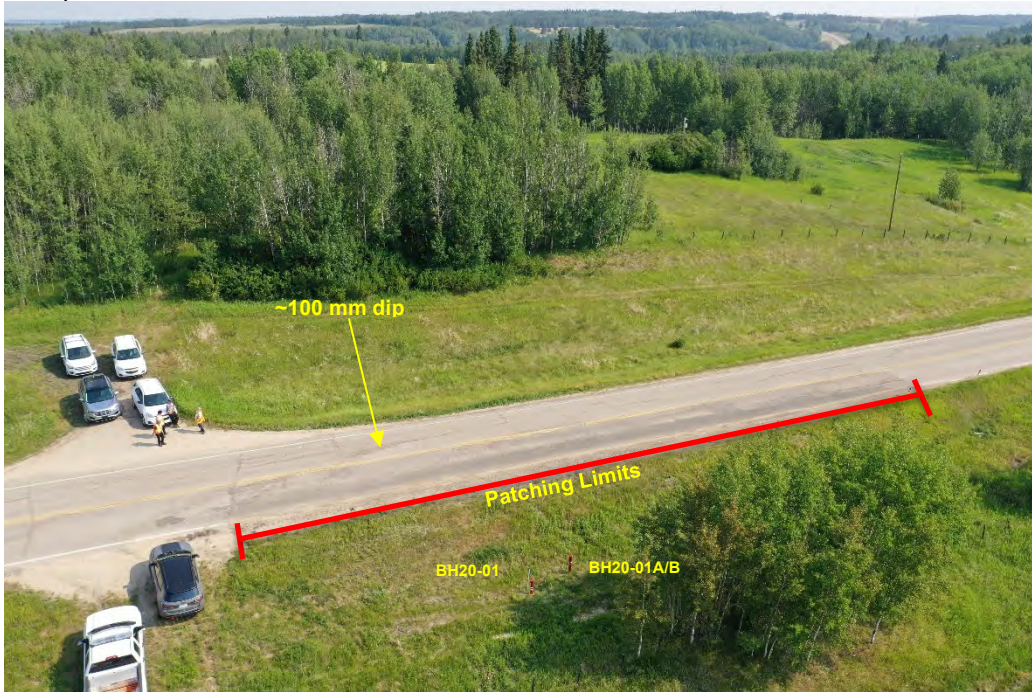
Pavement cracking along Highway 16A. Looking north.
